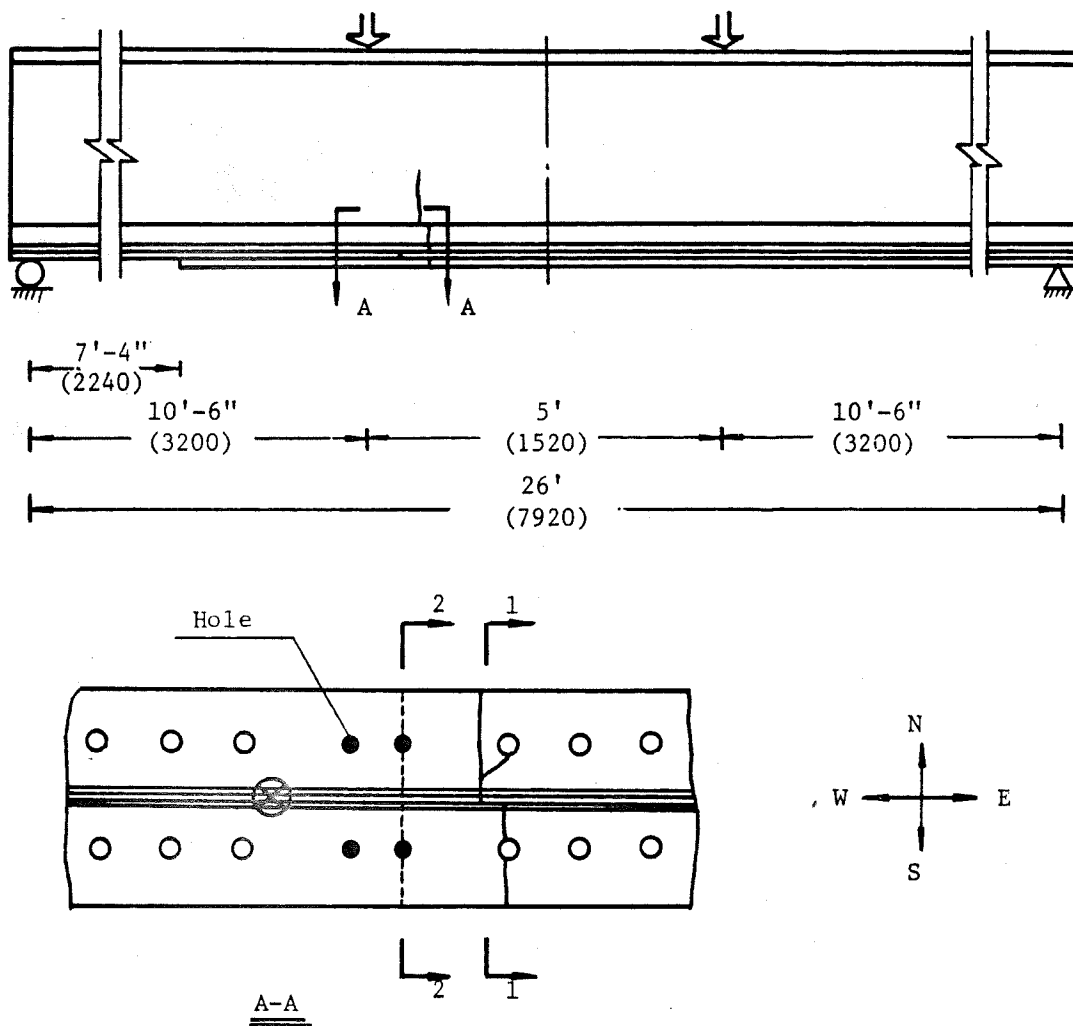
Cracked Section 1-1 of Girder No. 10
